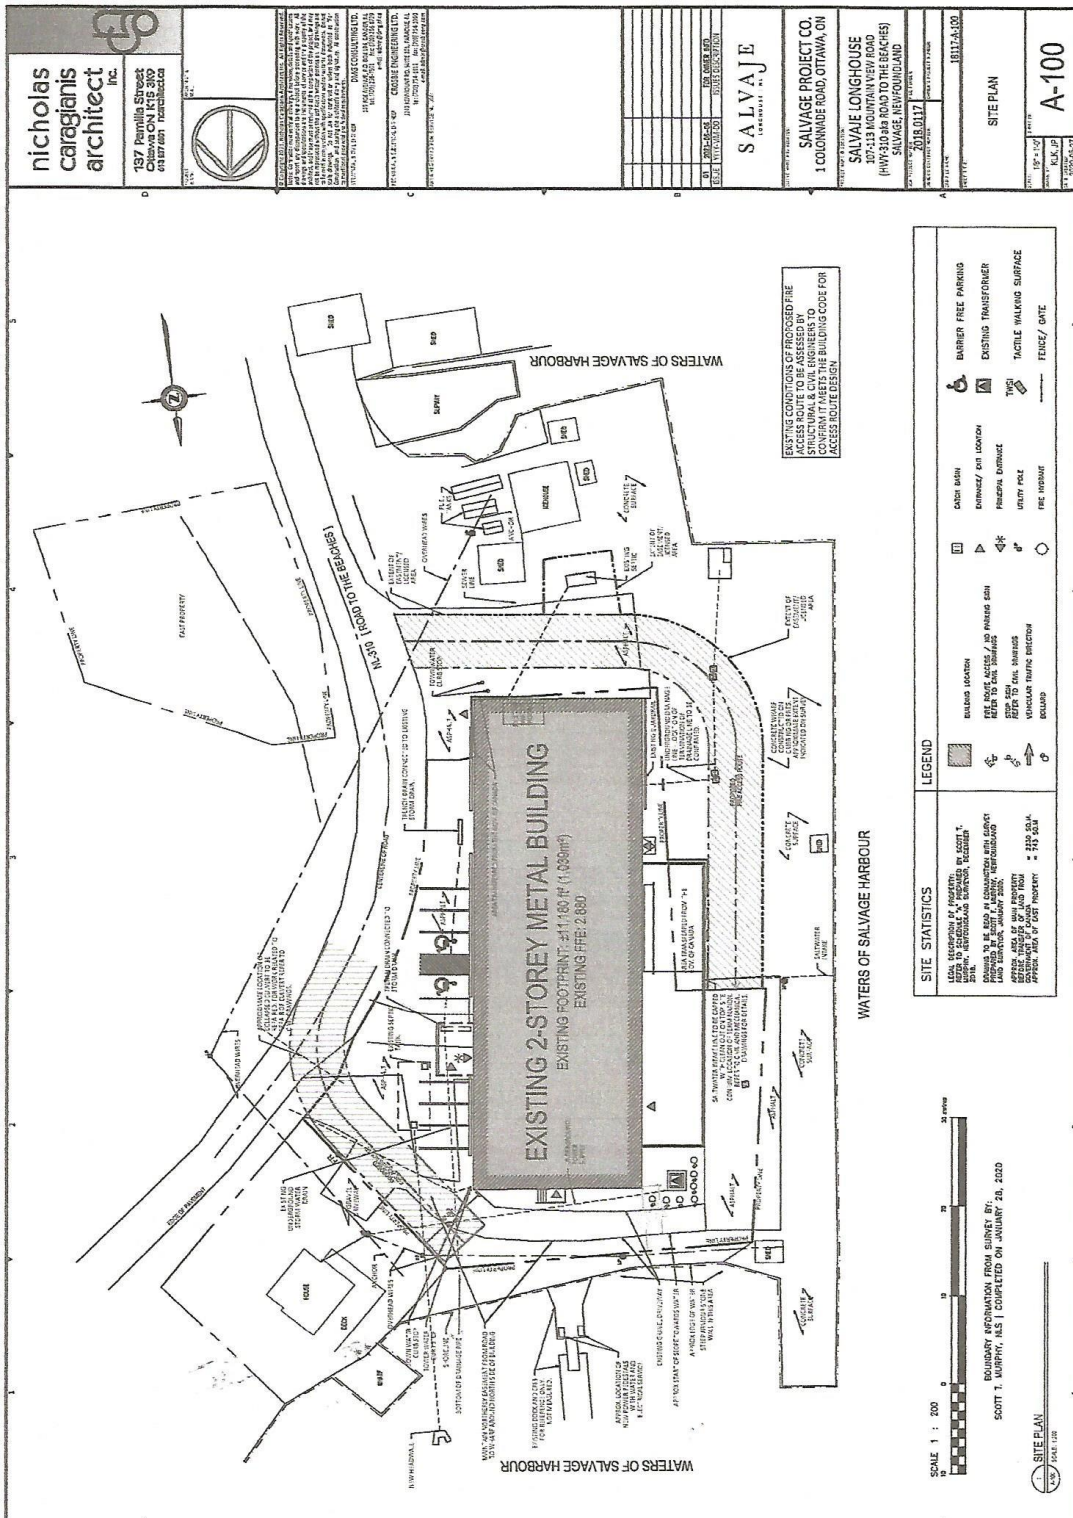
Site Plan for the Salvaje Brewing Company Structure
